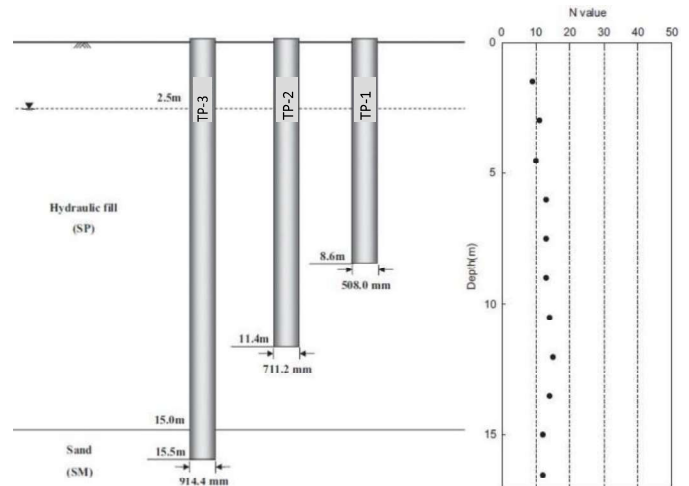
Details of test piles and soil conditions (adapted from Jeong et al., 2015).
